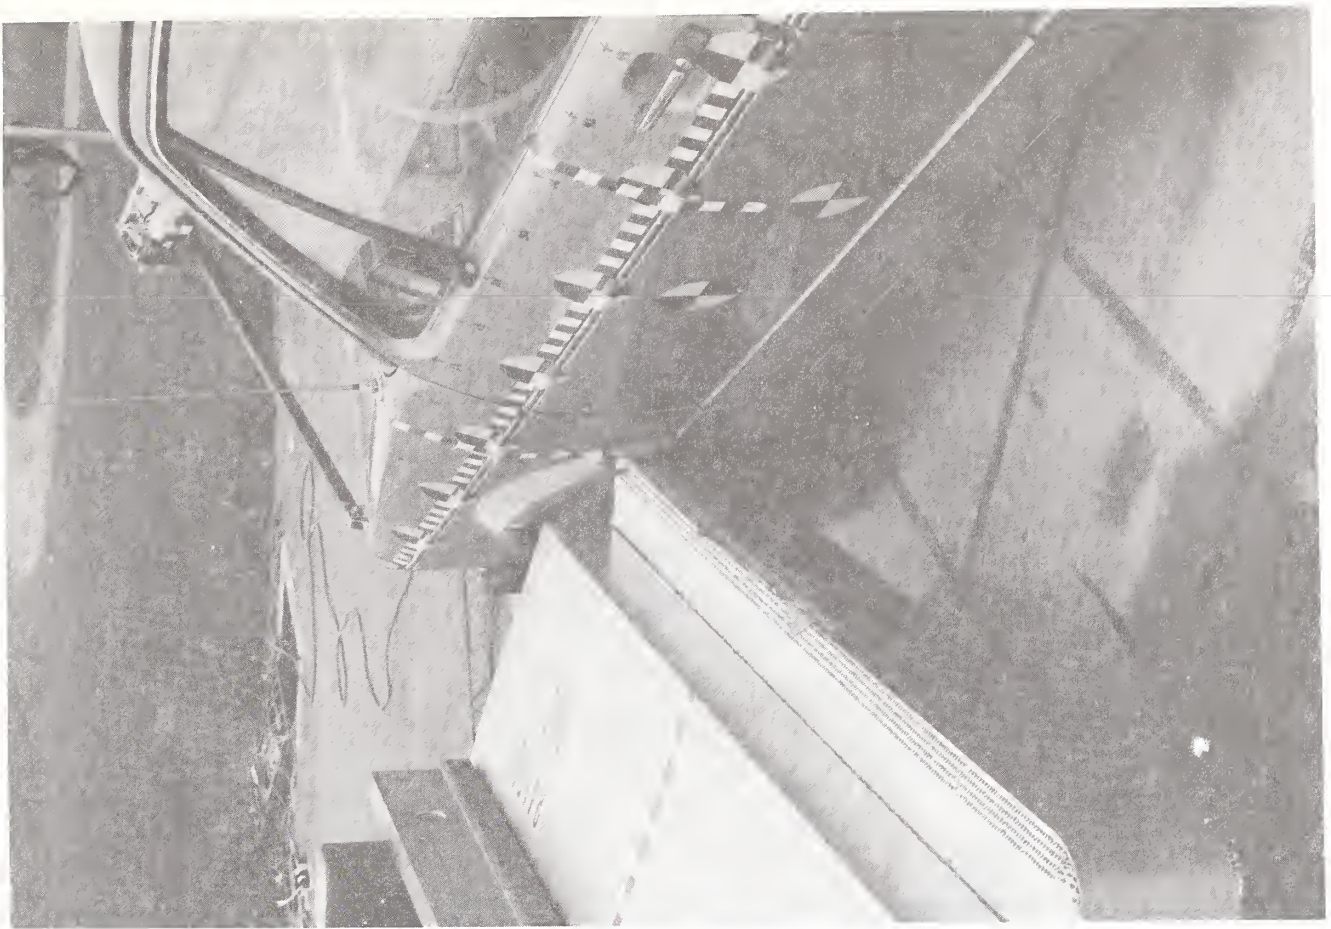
PRE-TEST CLOSEUP - VIEW 3
